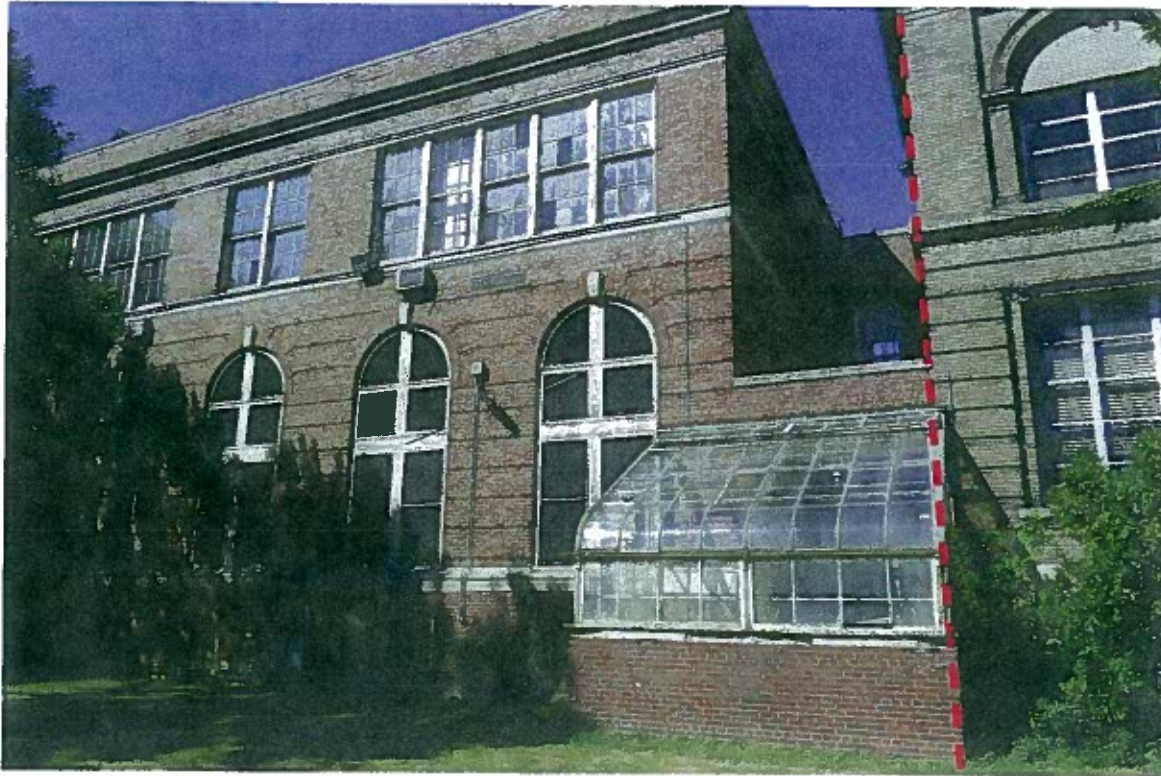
View looking southwest. Albrecht Hall on right and Rincker Library on left. Greenhouse addition is in very poor condition. As all building faces are “primary” facades, this location is the only one that does not have significant visual impact on the historic facades and a new accessible entry would fit.
